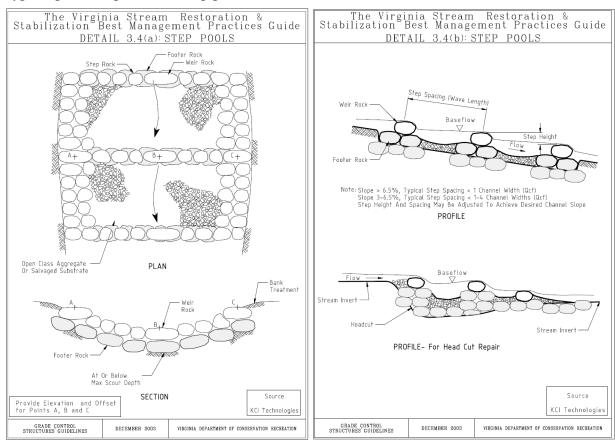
Step Pool Plan and Profile Source: Virginia Stormwater Management Handbook
